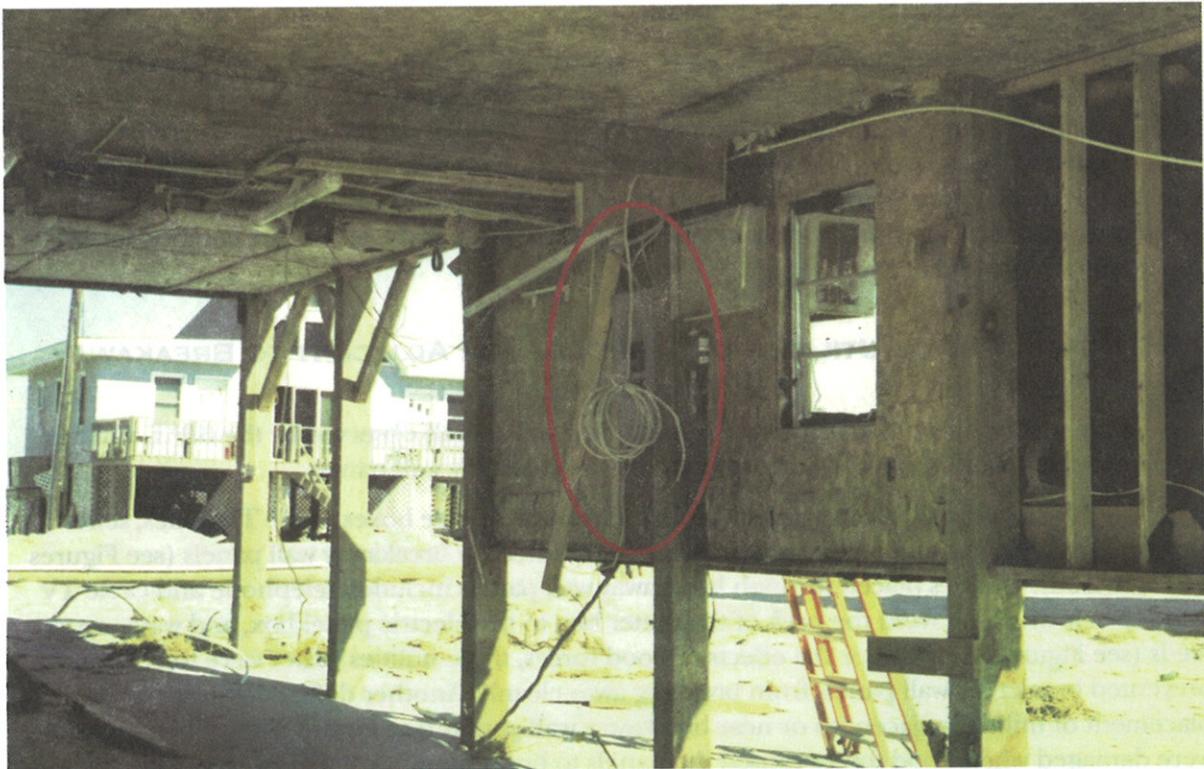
Example of utility component (electric panel box) installed on a breakaway wall panel.
